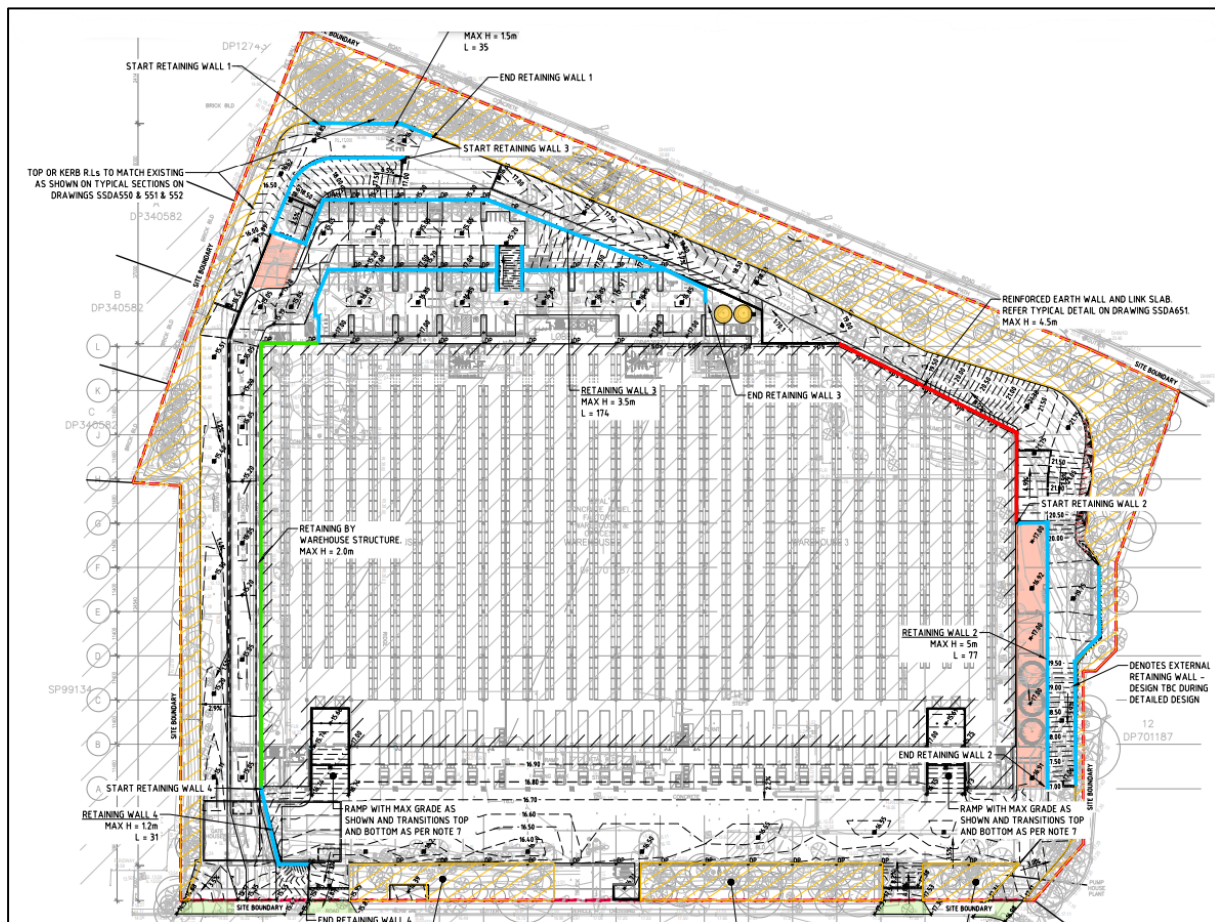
Proposed Retaining Walls (Source: Costin Roe Consulting, 2024)
